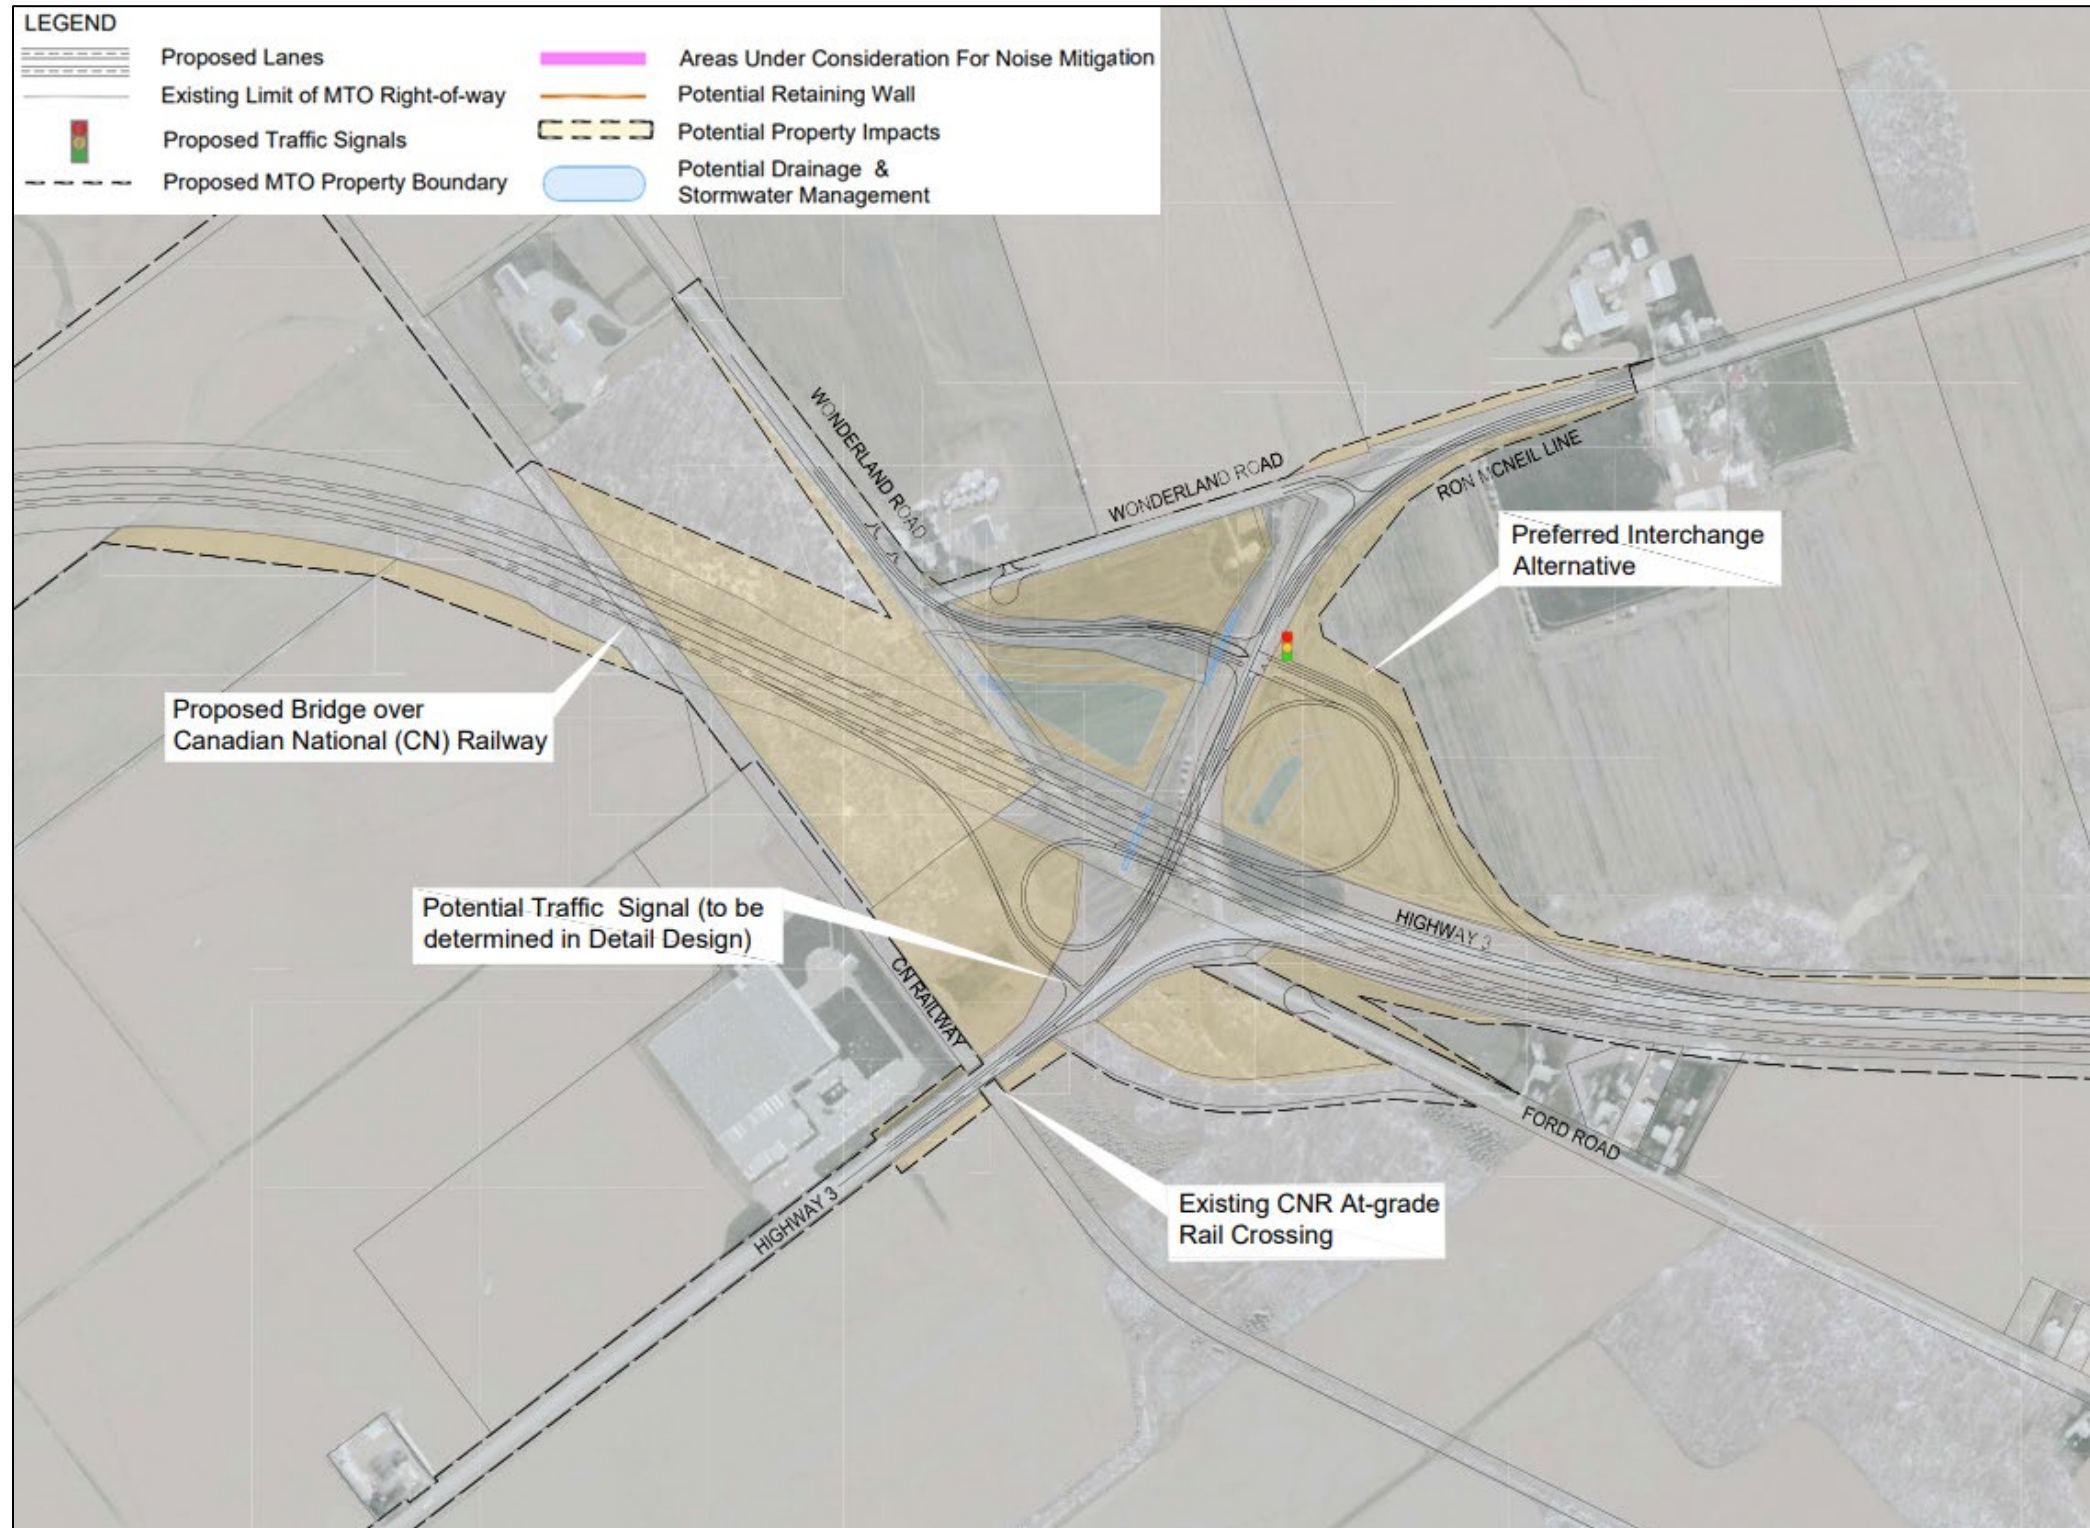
Recommended Plan at Ron McNeil Line/Wonderland Road Interchange
